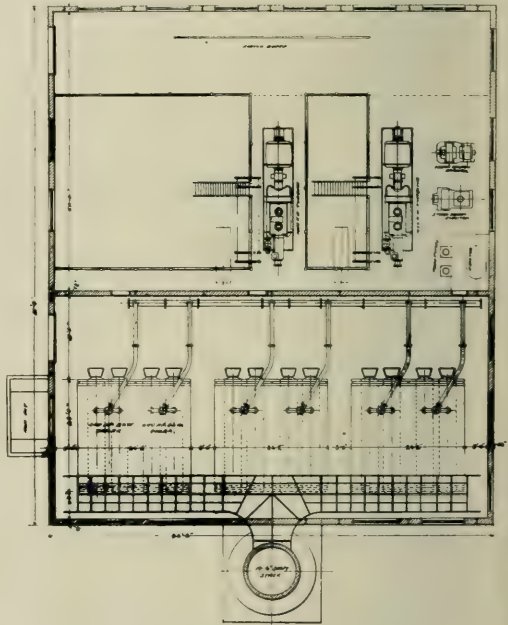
GENERAL PLAN OF POWER HOUSE.
